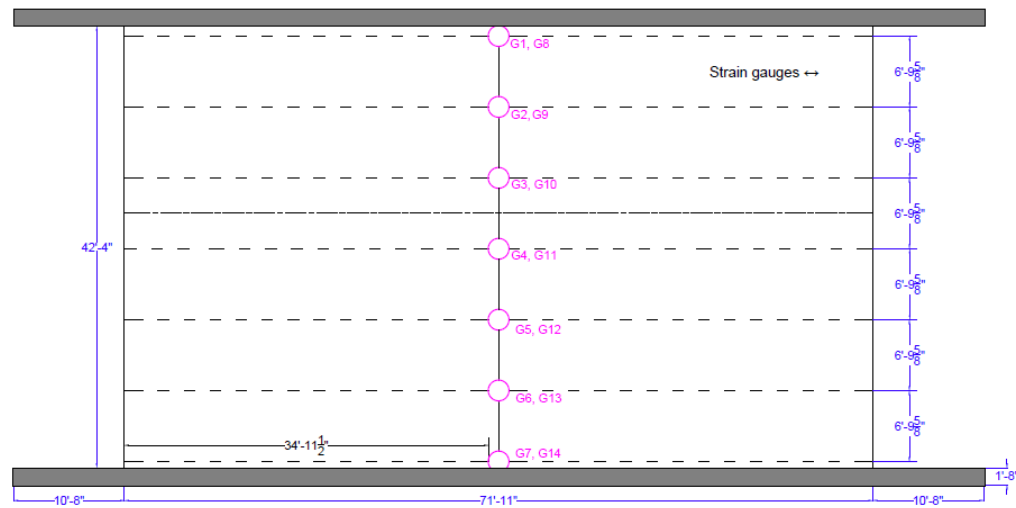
Strain gauge distribution on the top and bottom of girders for live load testing of steel-reinforced bridge deck (27W36)
